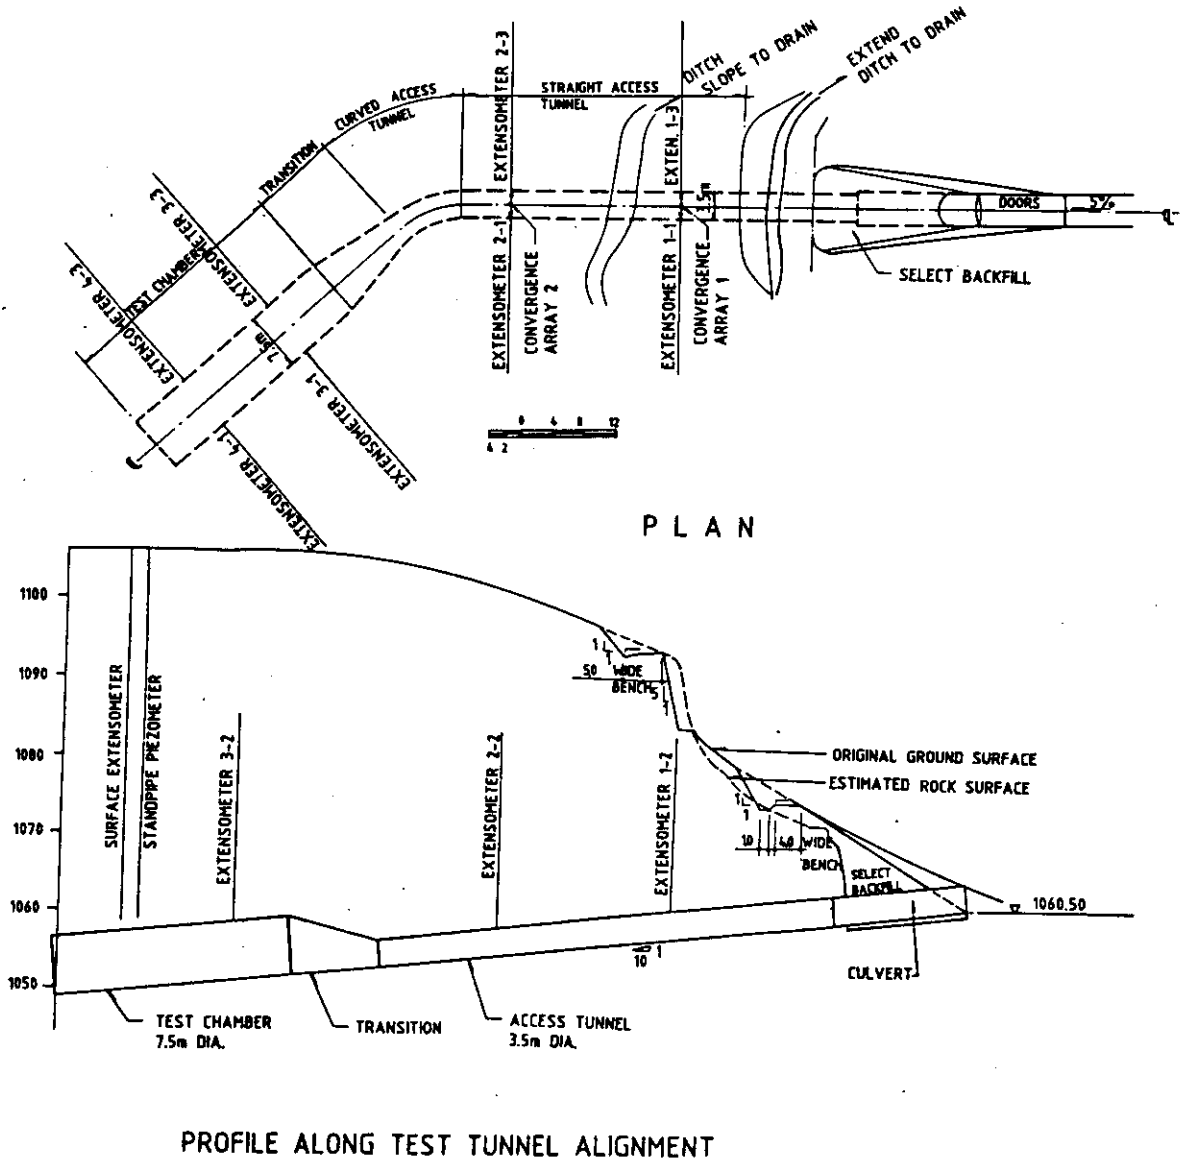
Test tunnel; plan, profile and instrumentation layout
